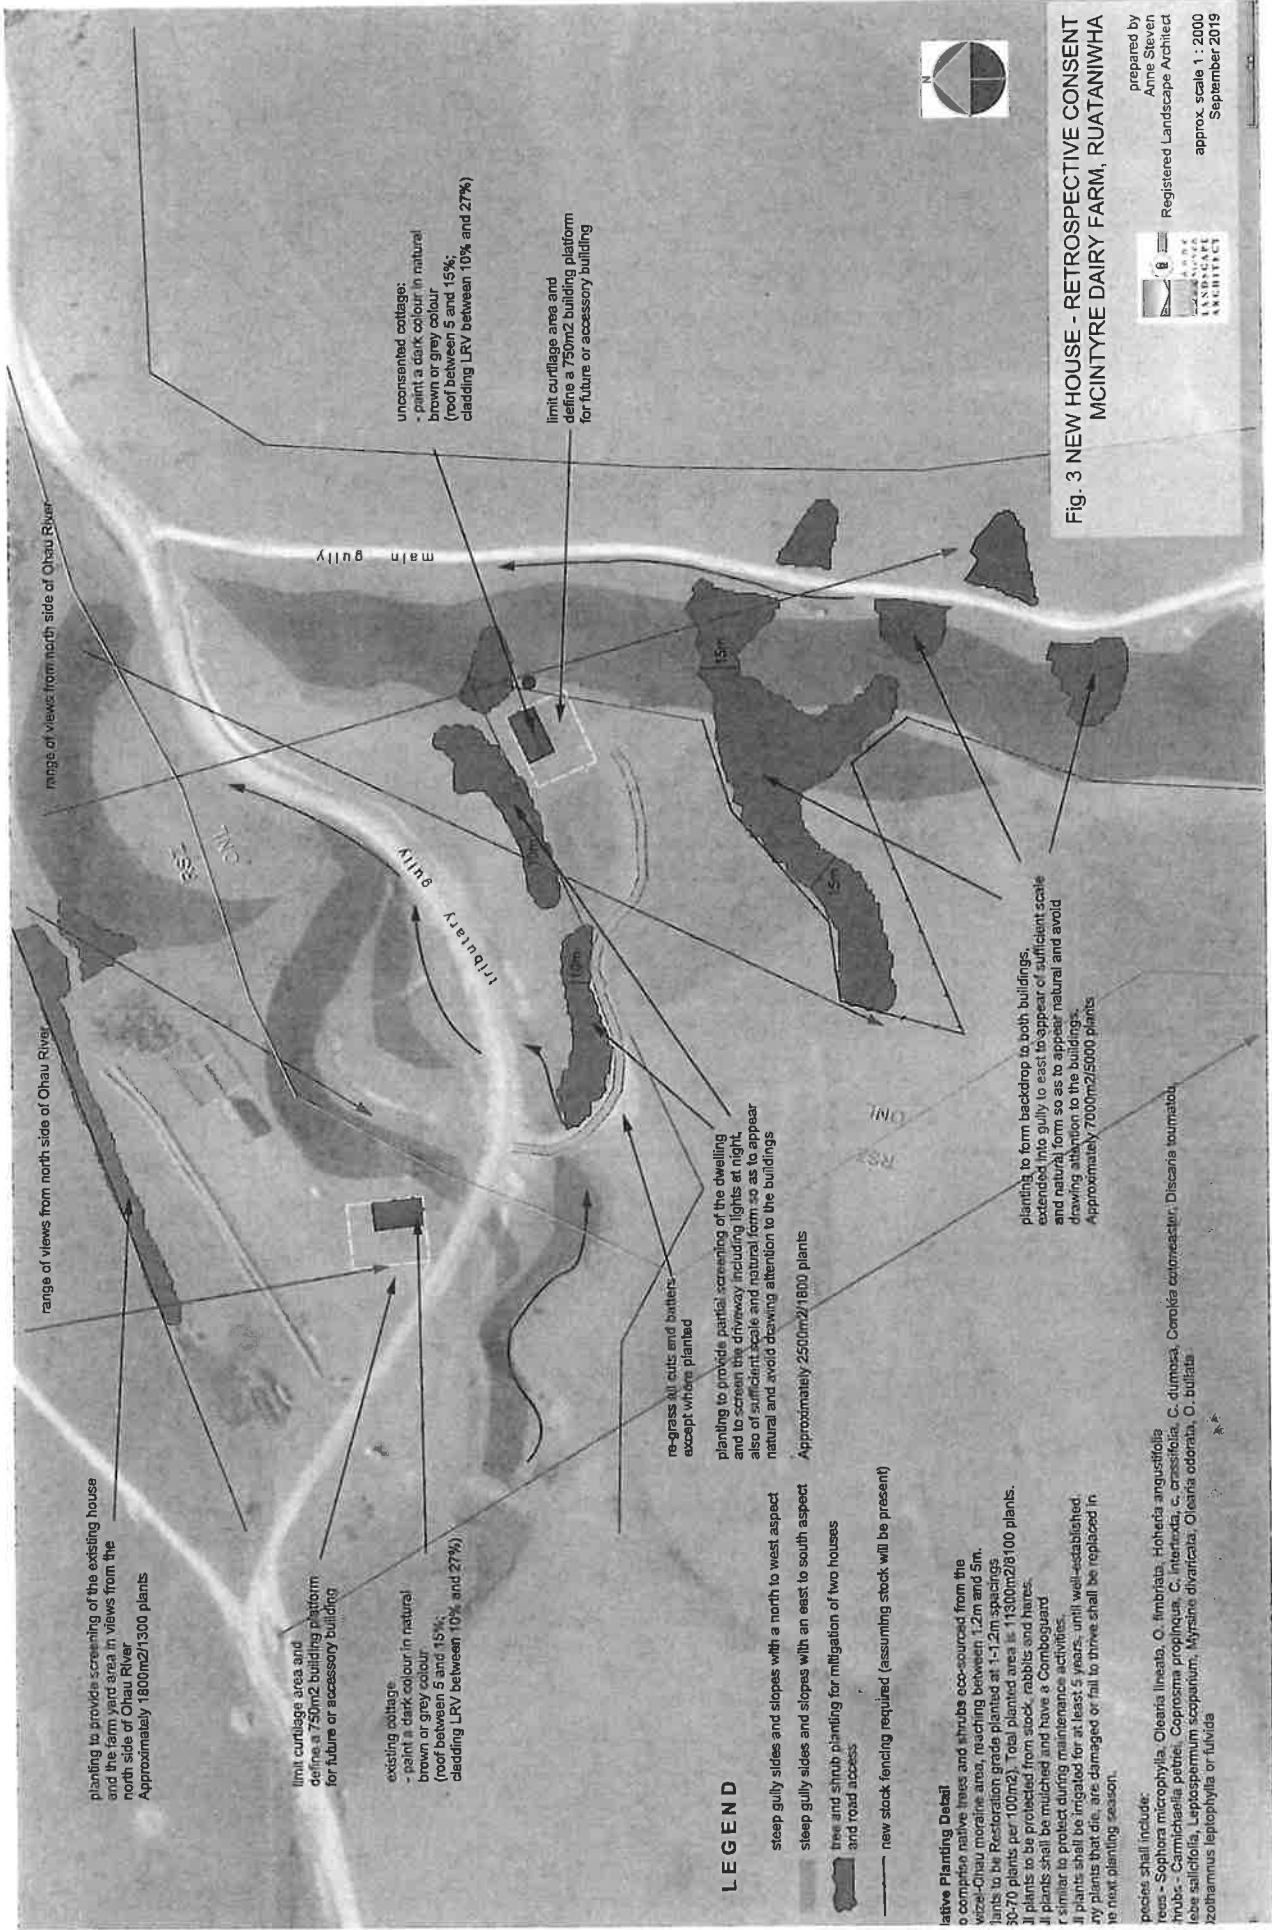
NEW HOUSE - RETROSPECTIVE CONSENT
